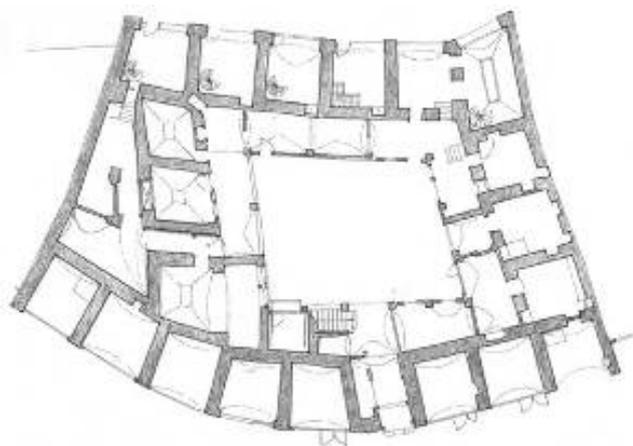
The Ground Floor Plan of Ali Pasa Han [4]
